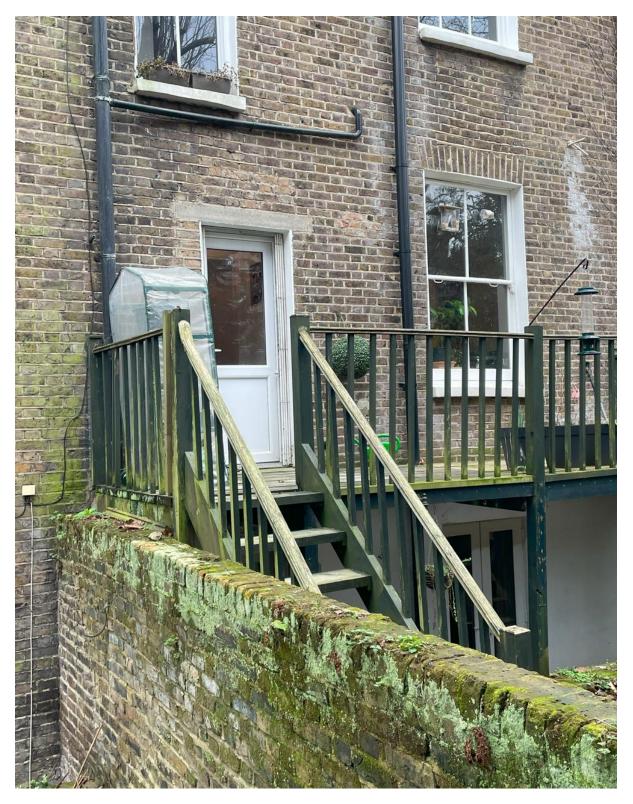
136 Belsize Road (neighbour): Door at the <u>ground floor</u> leading to a wooden platform (1.7m extension) overlooking my garden
